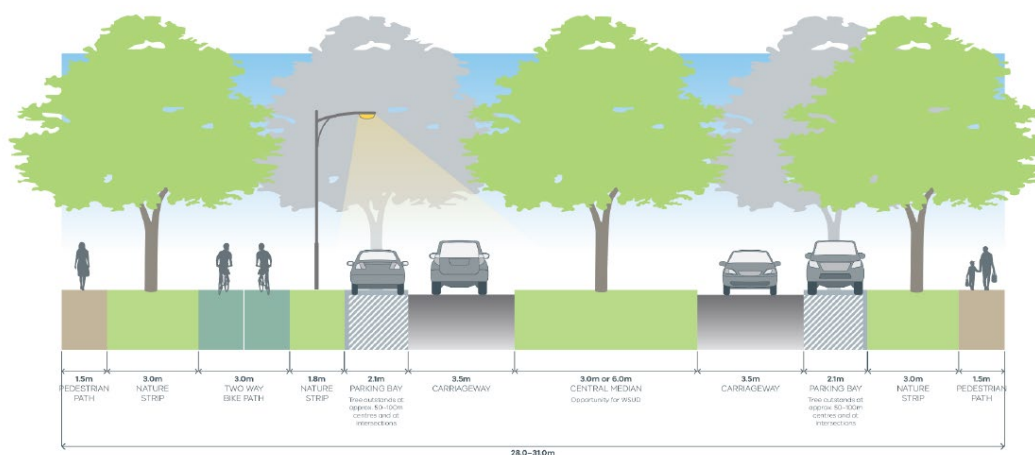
Connector Street - Boulevard (28.0-31.0m) [source: VPA, September 2019]
